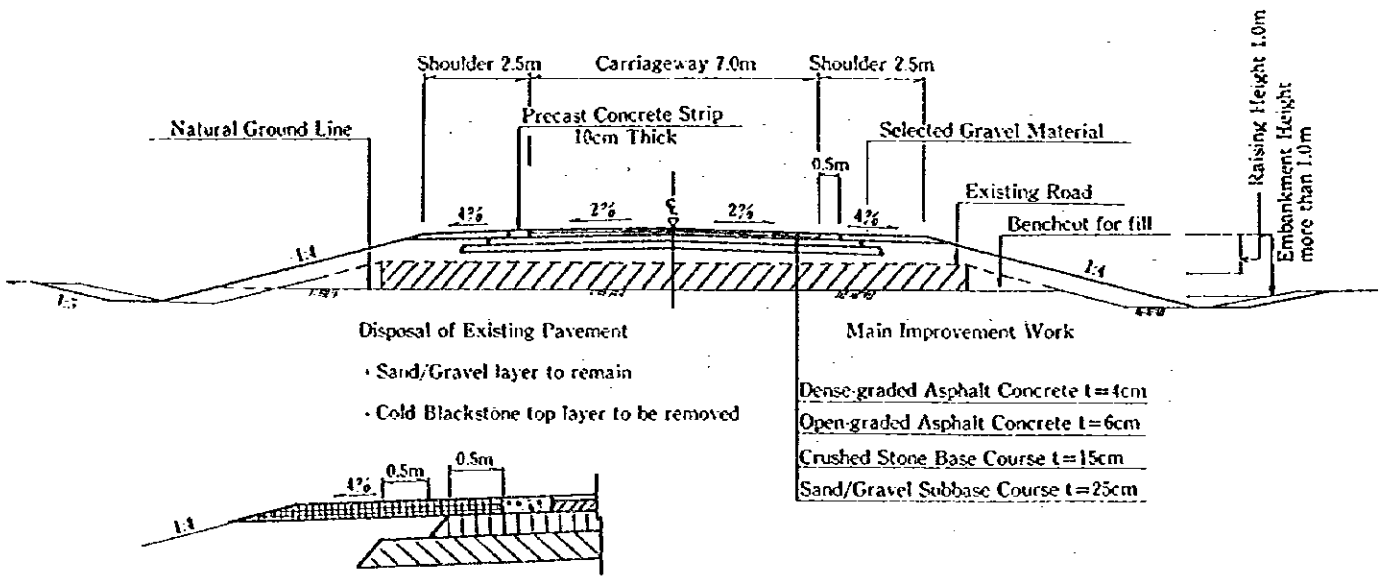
(2) : Cross-Section of Road for Type-II Improvement
